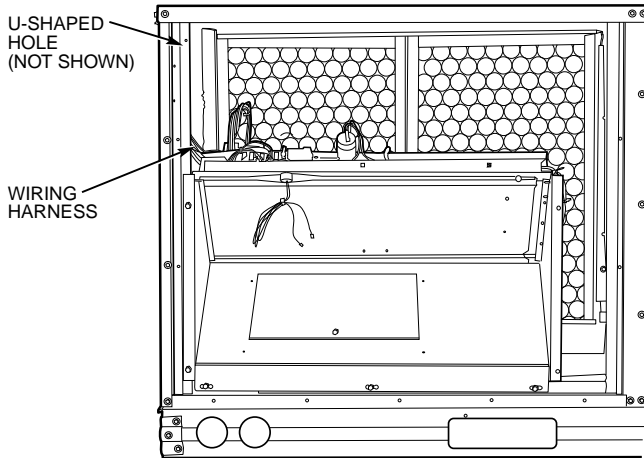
Vertical Block-Off Plate Installation (10 and 12 1/2 Ton Units Only)
